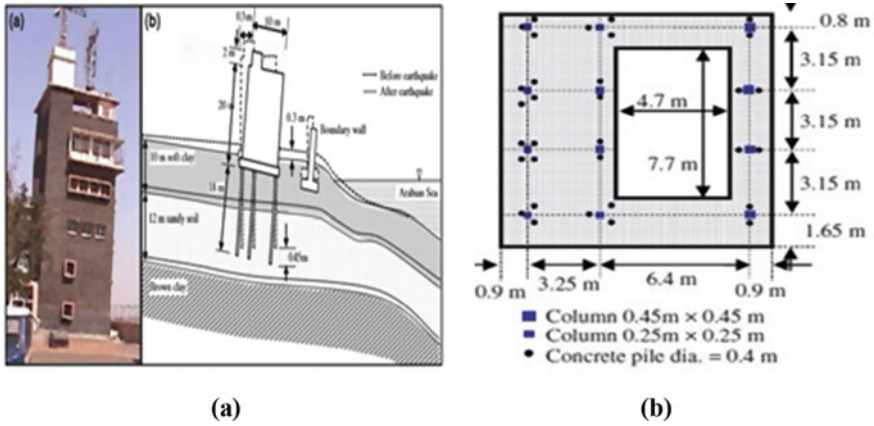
a Tilting and pre- and post-earthquake configuration, and b foundation layout plan of Kandla Port building [14]
